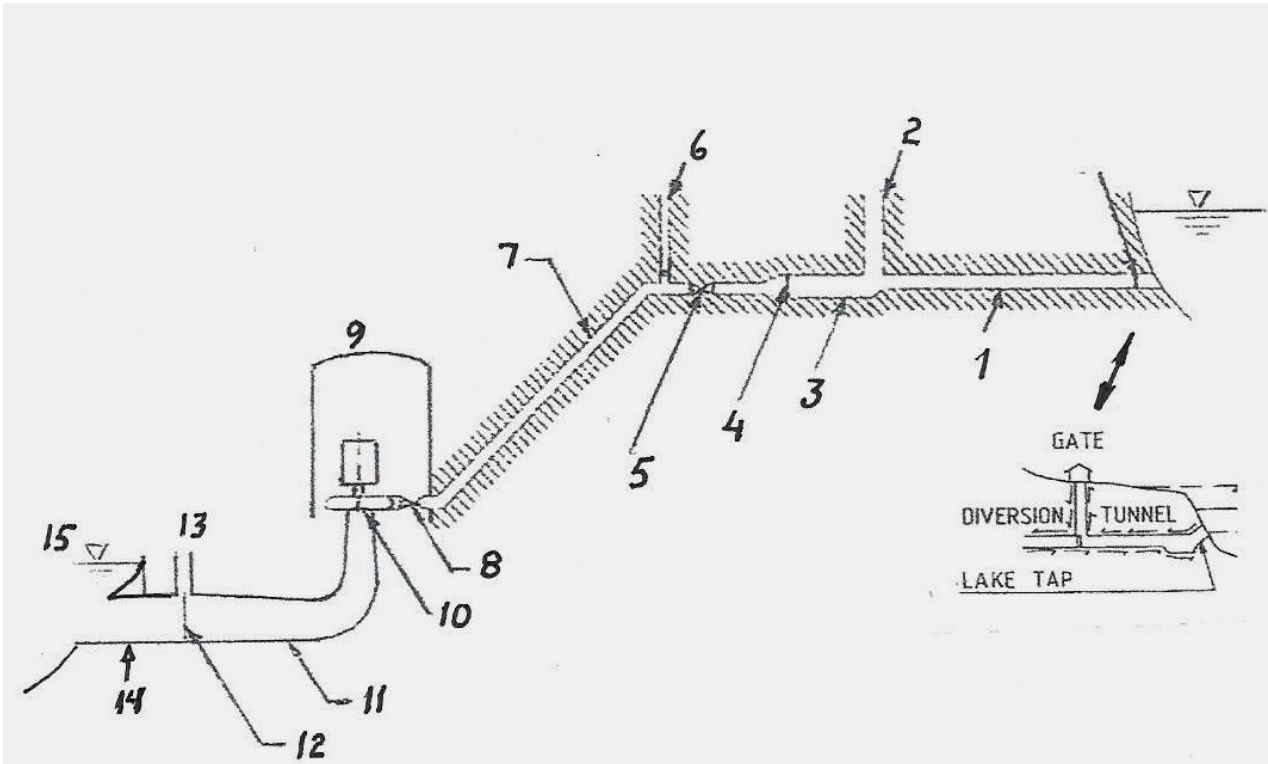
The sketch is showing the water conduits in principle. Upstream reservoir and intake gate as well as the stone trap is illustrated in the detailed figure. Further, (1) Head race tunnel, (2) Surge shaft, (3) Sand trap, (4) Fine trash rack, (5) Penstock isolating valve, (6) Air inlet valve to prevent vacuum when draining the penstock, (7) Penstock, (8) Turbine inlet valve (9) Power house (excavated in rock), (10) Turbine, (11) Draft tube, (12) Draft tube gate, (13) Outlet surge shaft, (14) Outlet tunnel, (15) Downstream reservoir.
